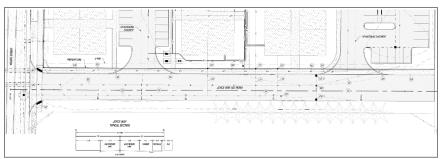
2 DR-22-06 1030 Young Street Sheet PP-2 Joyce Way east half-street
